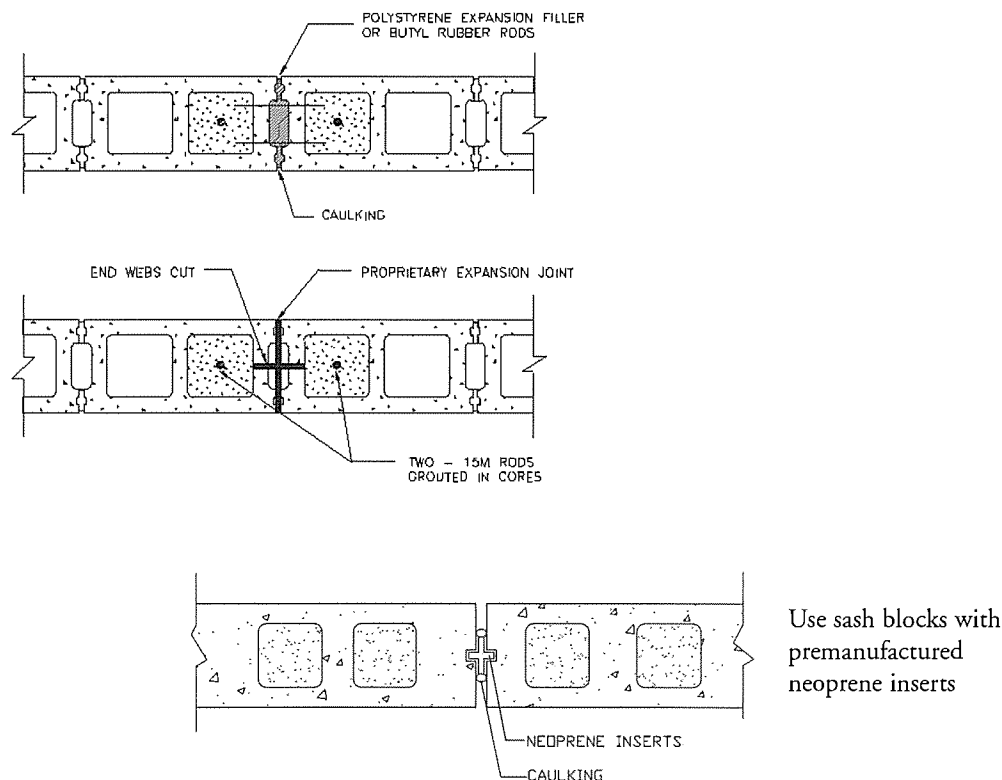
Single-wythe Hollow Block Horizontal Section
